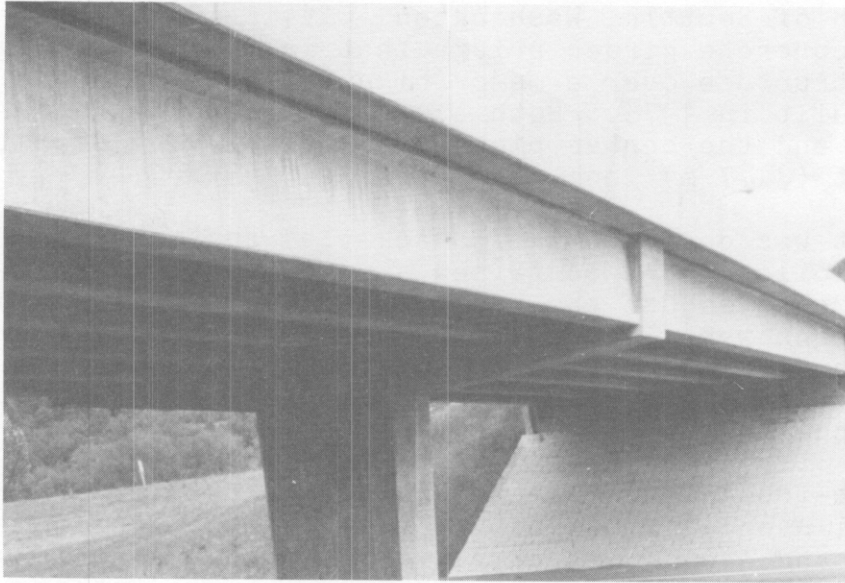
Pier No. 2 and Concrete Girders of Anderson Road Overpass
